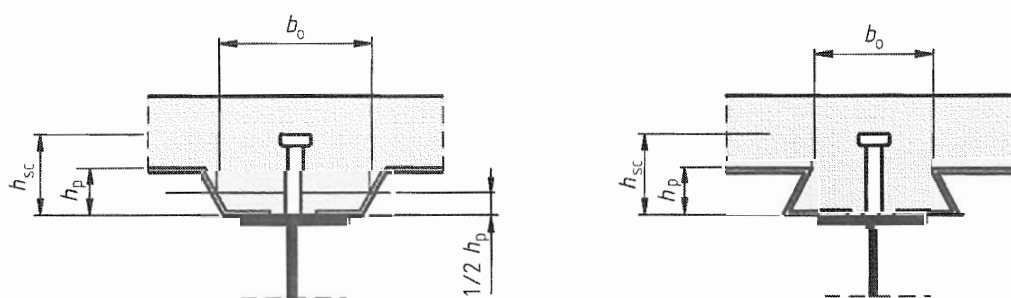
Beam with profiled steel sheeting parallel to the beam
